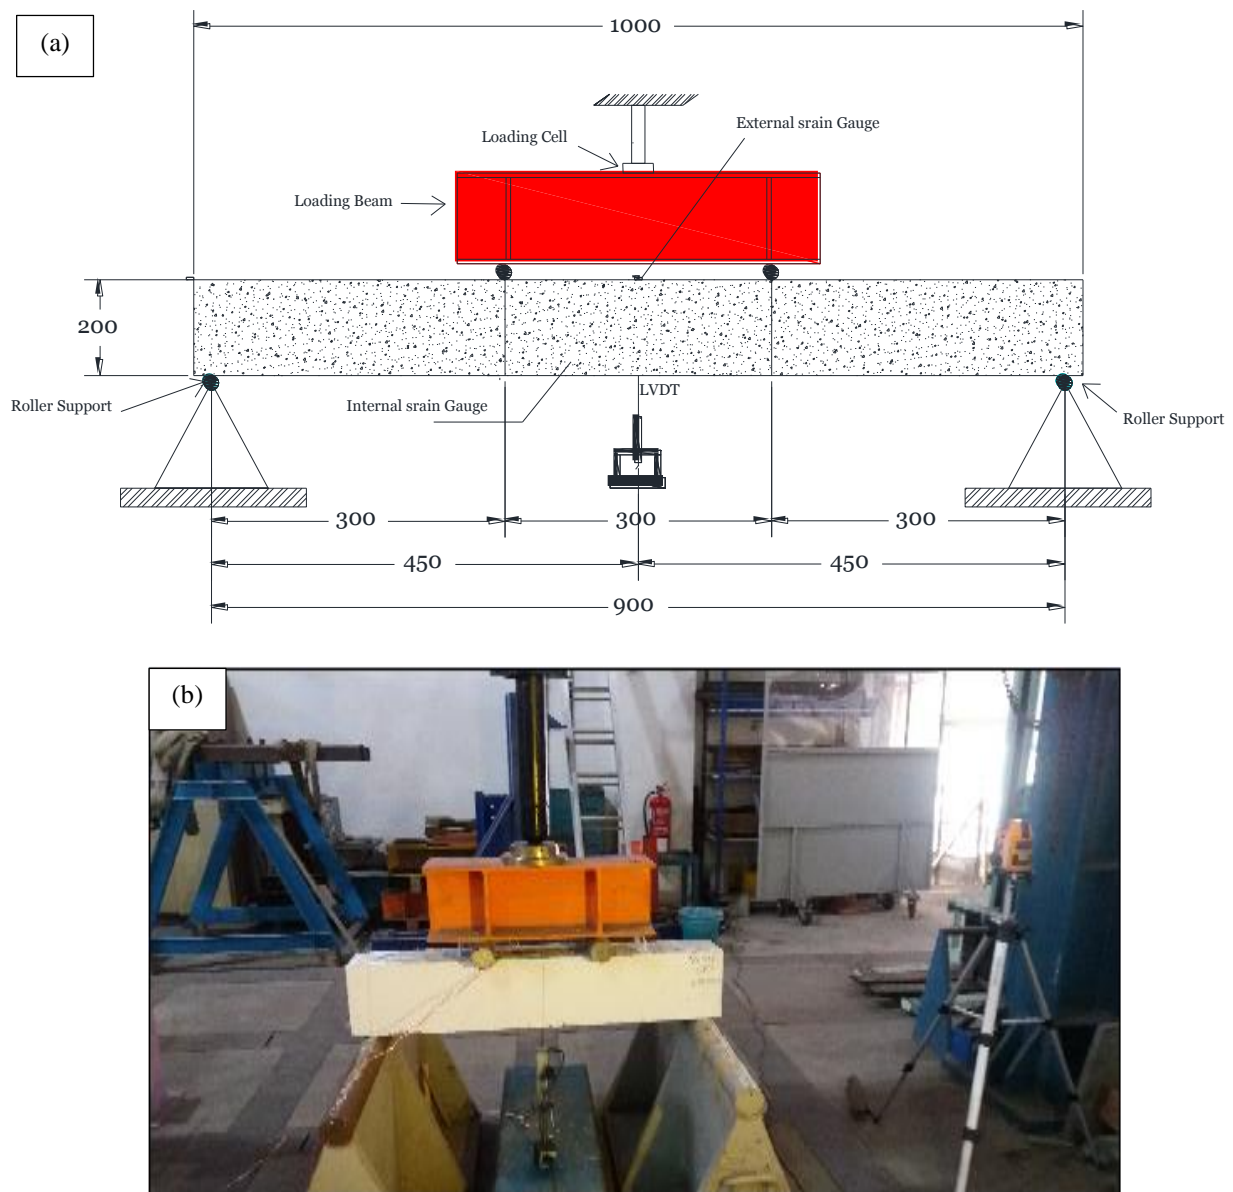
Beam Set-up a) Schematic Beams Test, b) Real Beams Test
